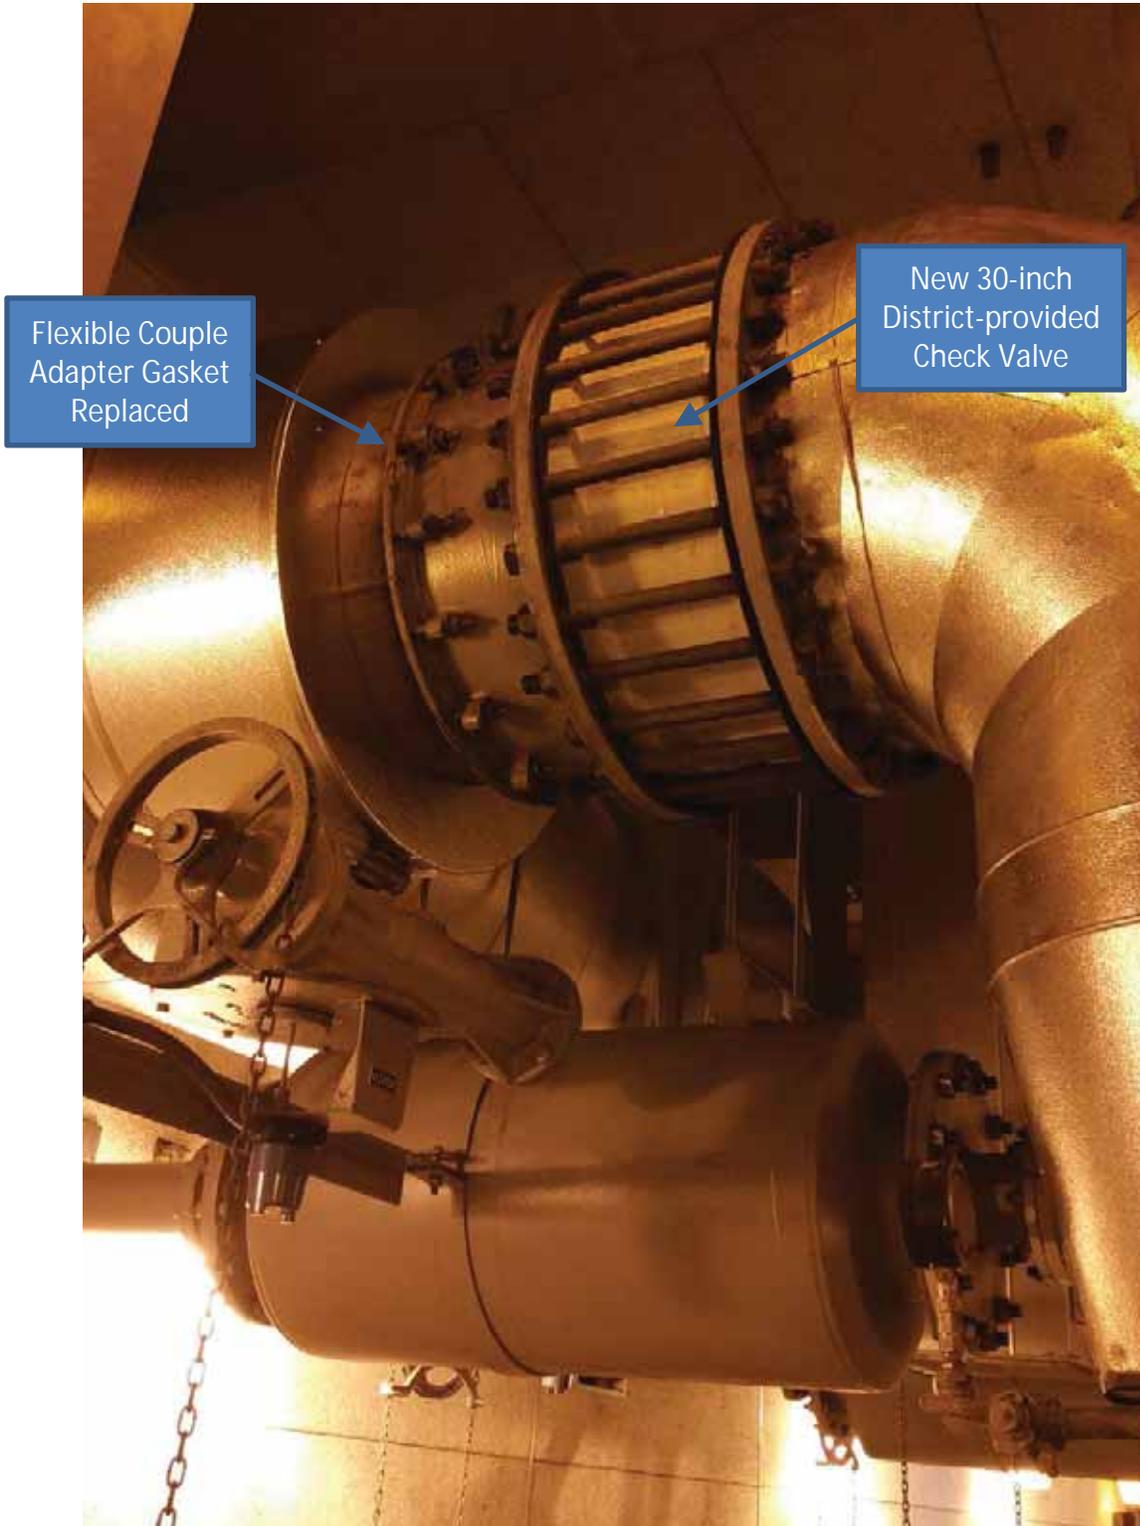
New 30-inch Insertion Type Check Valve Installed at Aeration Blower No. 8
